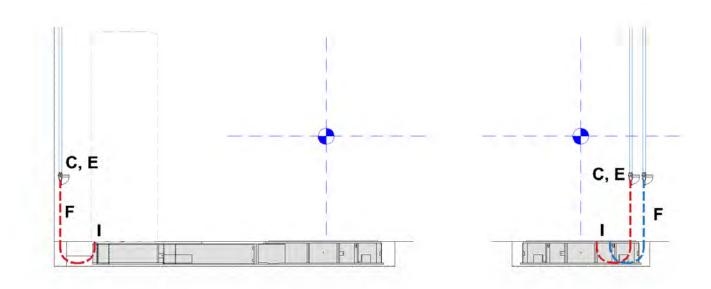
Cooling Line Access - Plan, Side, and Front
